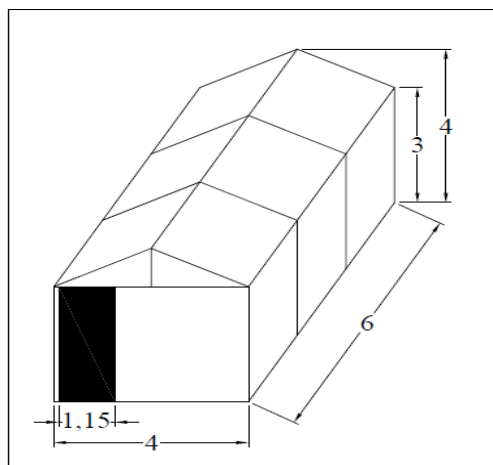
The schematic diagram of gable-even-span greenhouse.
